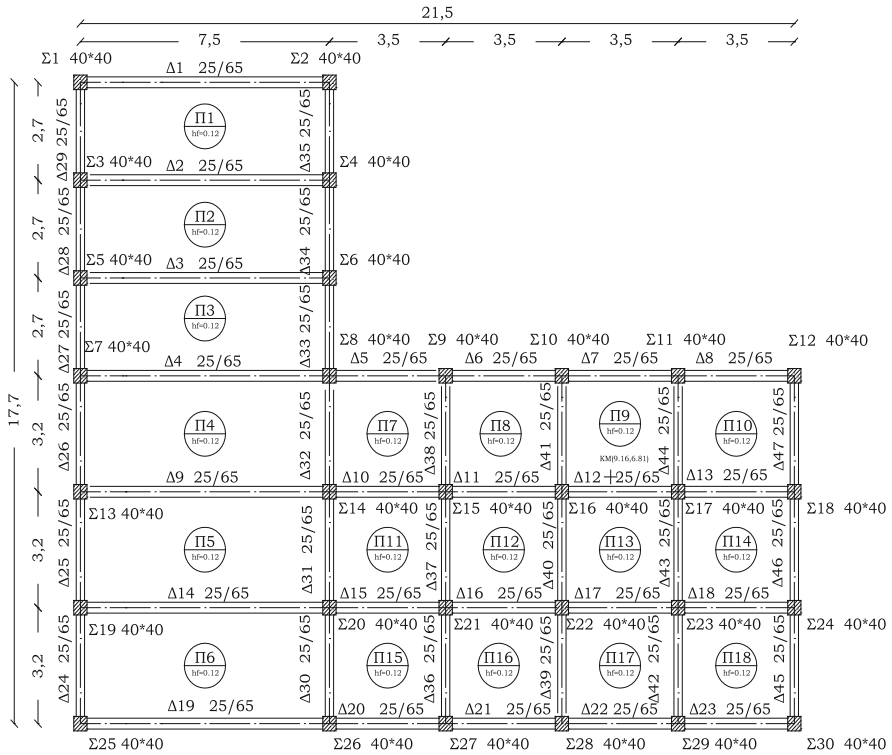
Typical storey plan and member dimensions (in cm) of the 4-storey building
